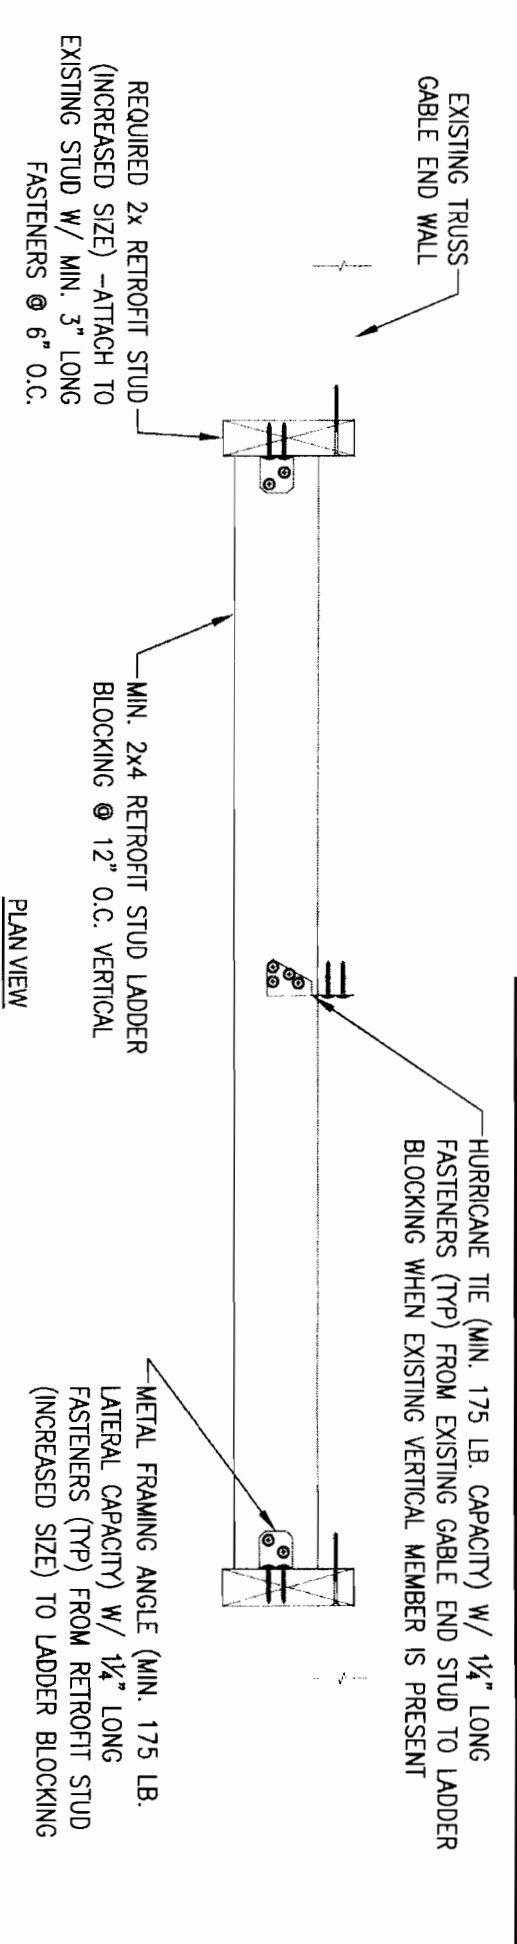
DETAIL OF LADDER BRACING FOR OMITTED RETROFIT STUD (TRUSS GABLE END)
